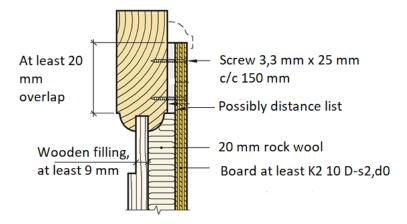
One-sided cladding on door leaves when the wood filling is less than 21 mm [4]
